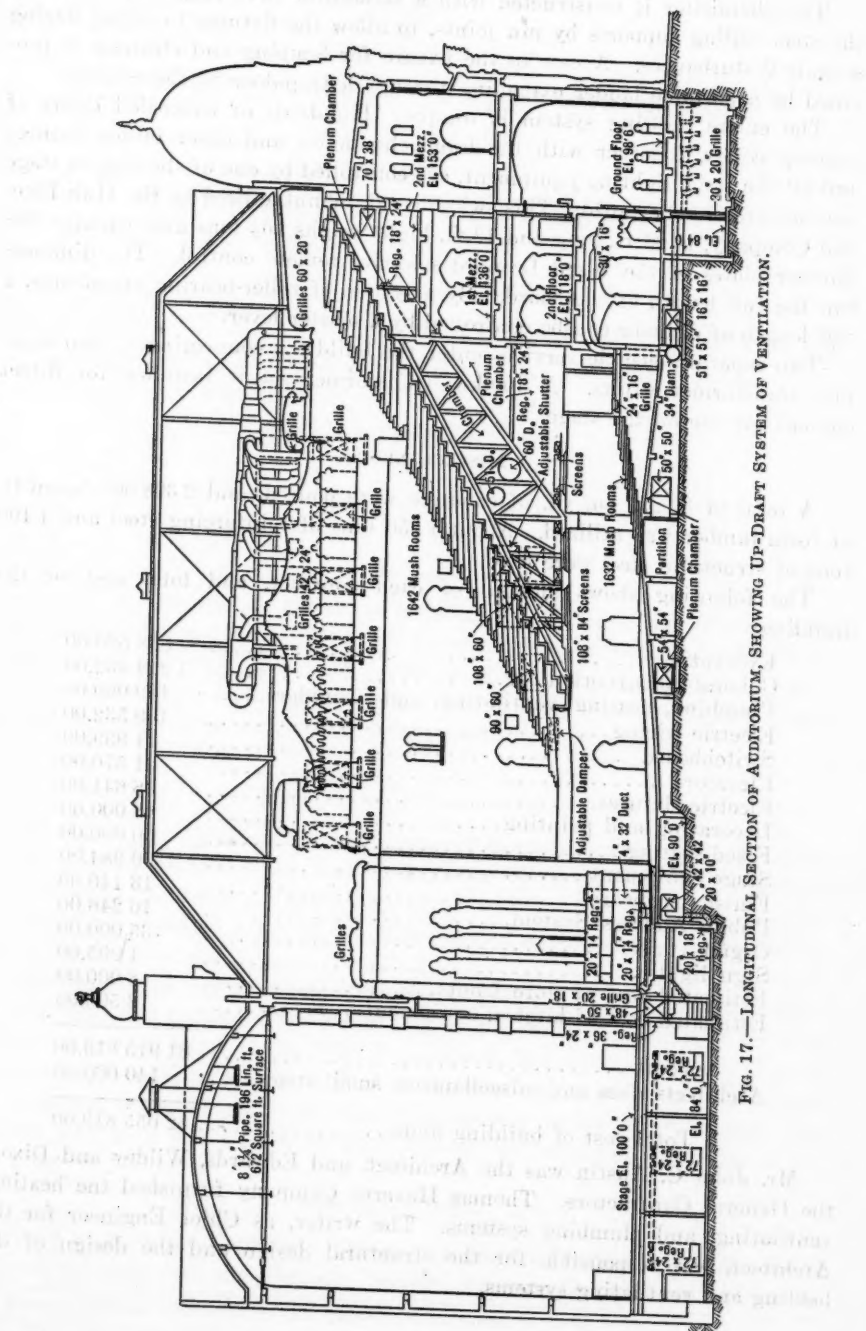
LONGITUDINAL SECTION OF AUDITORIUM, SHOWING UP-DRAFT SYSTEM OF VENTILATION.
